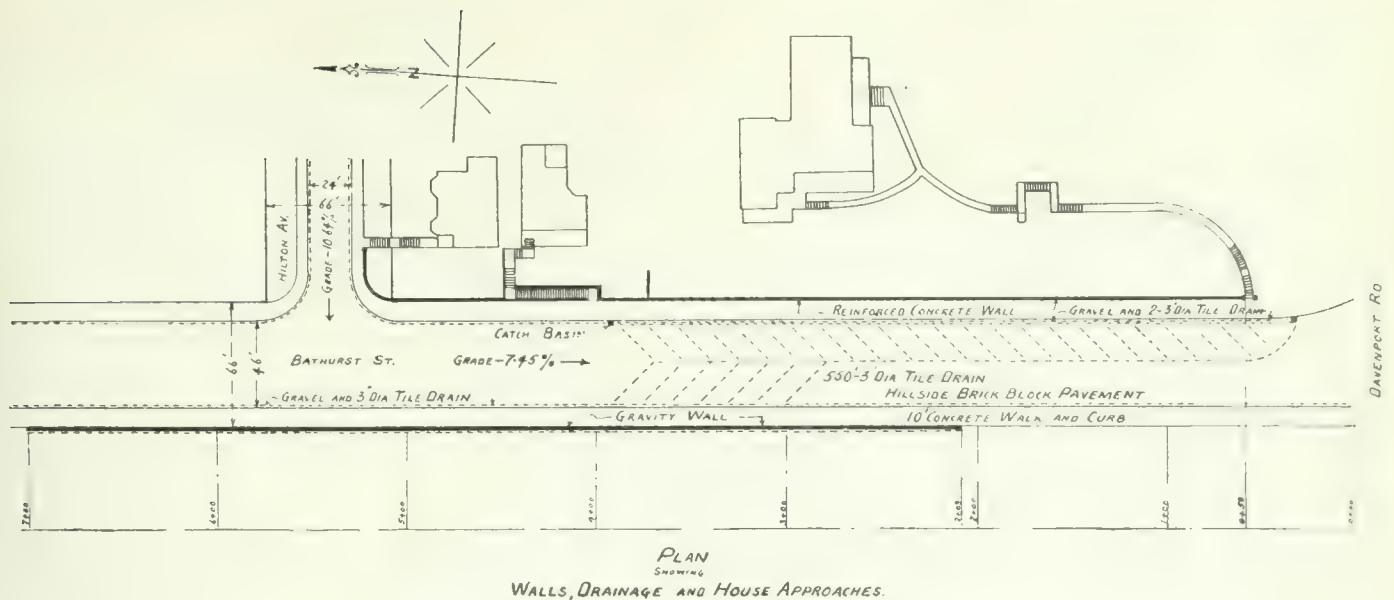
Sketch Plan Showing Location of Walls on Bathurst Street.
